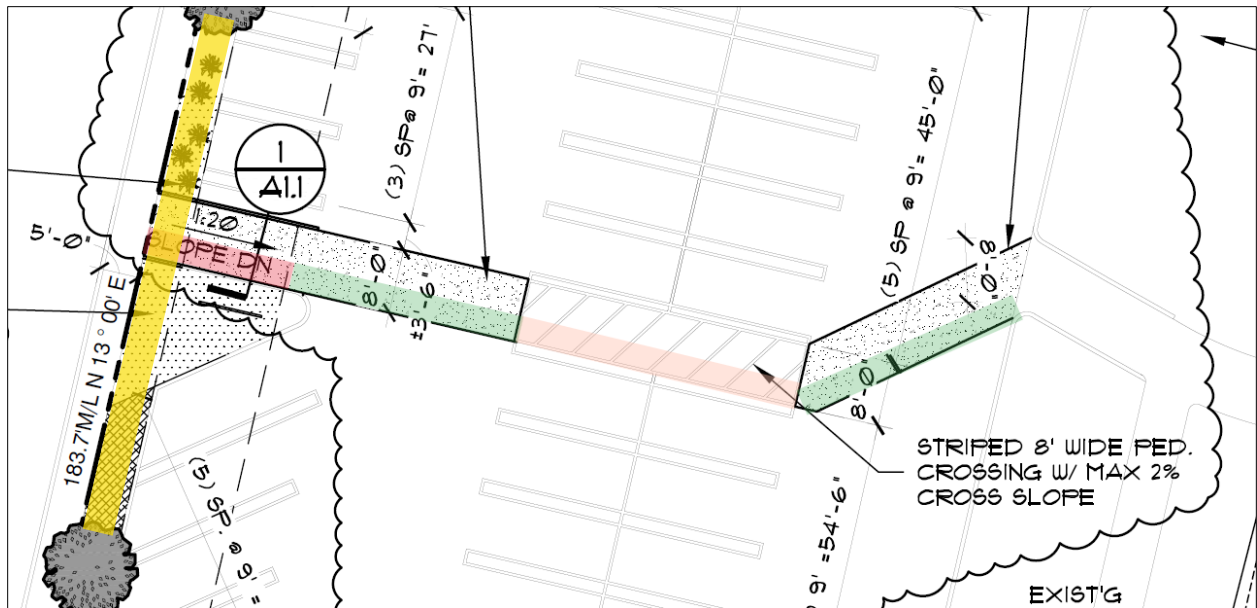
Exhibit A. Site Plan Sheet A1.1. Dated 5/7/24
